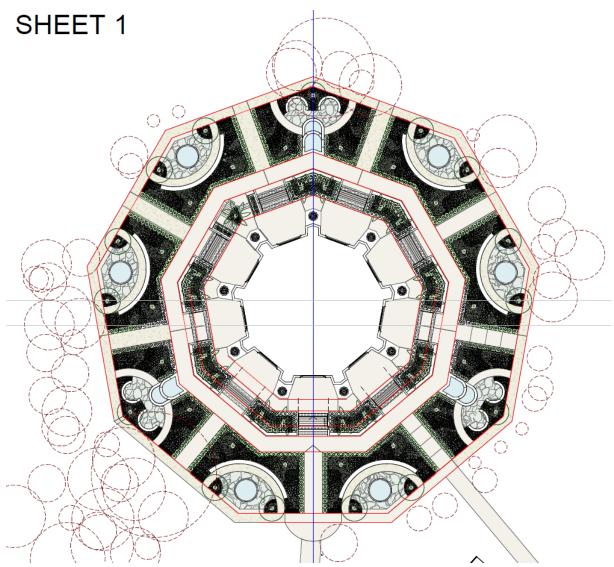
Overview of the scope of works and proposed new landscaping showing full extent. *Source: Urbis, August 2023
